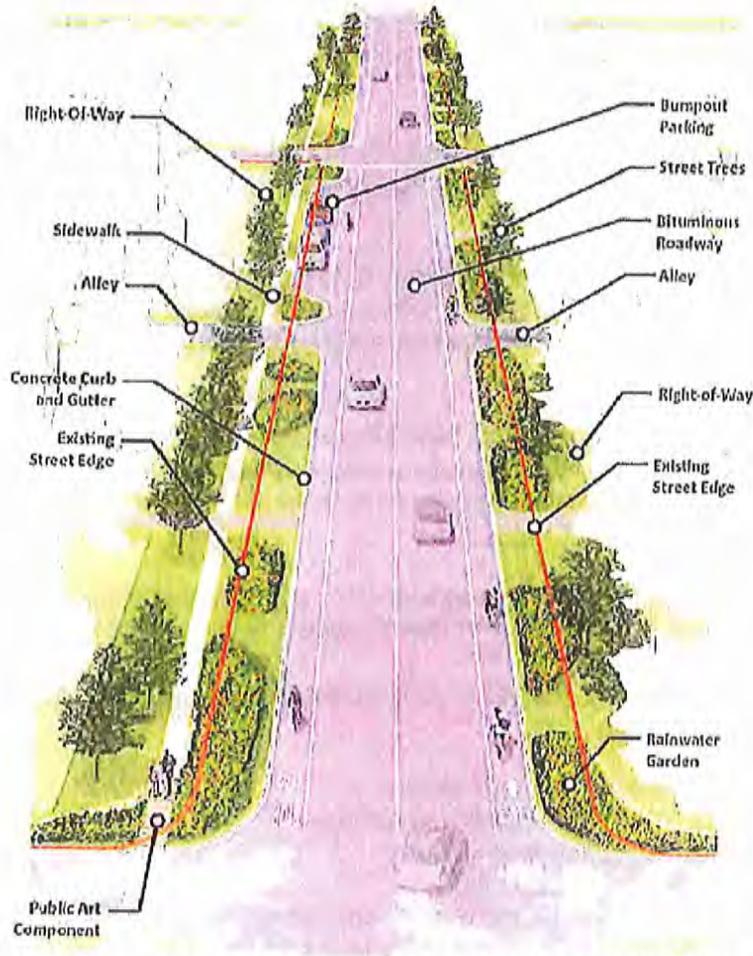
COLLECTOR STREET - RWMWD/BARR REPORT
